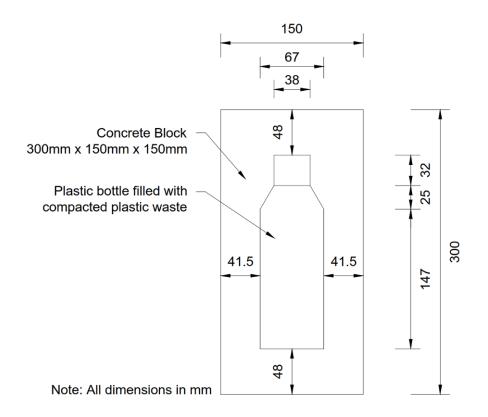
Proposed Concrete Encased Ecobrick Design.
